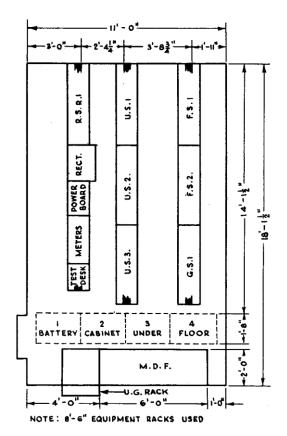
SINGLE STOREY PREFABRICATED BUILDING.
